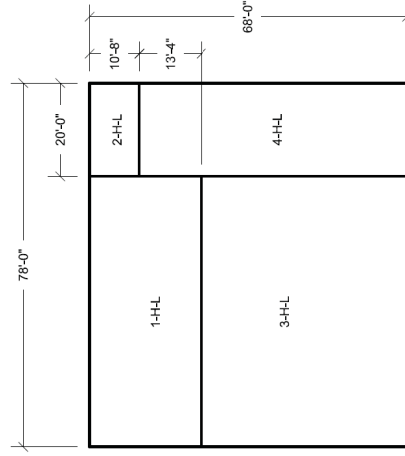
H.6-56: PUMP HOUSE WEST WALL LOOKING EAST
